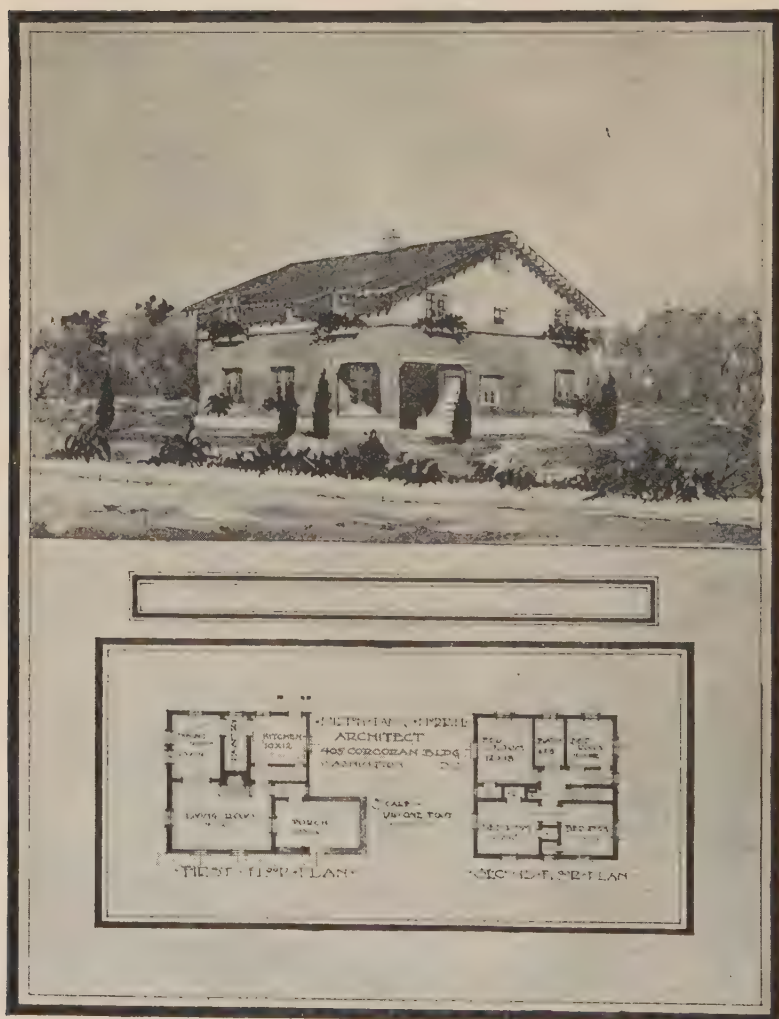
DESIGN FOR A SEVEN-ROOM SANITARY CONCRETE HOUSE.
